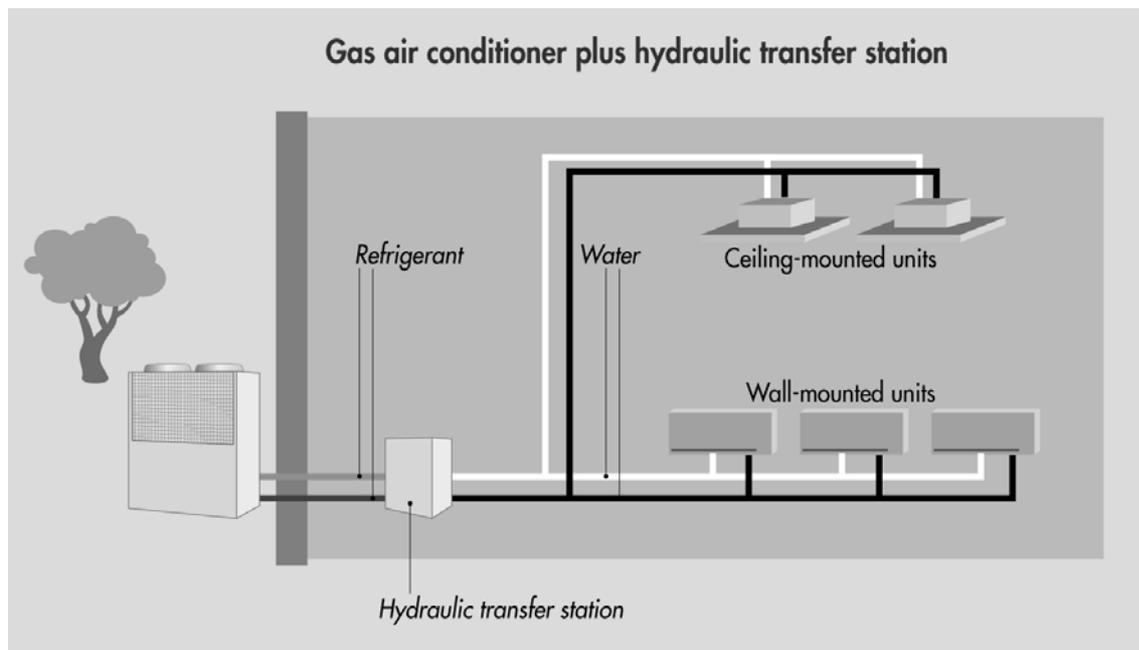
Gas air conditioner combined with a hydraulic system. A hydraulic transfer station forms the interface to the refrigerant system of the outdoor unit.
